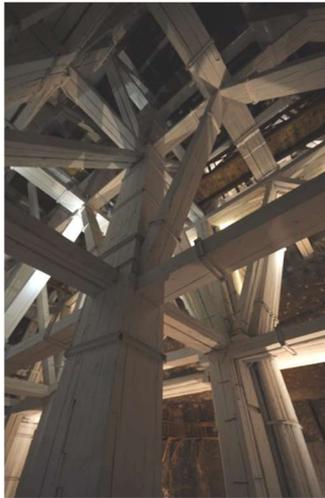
Wooden truss-type support in an excavation mined by block working- Michałowski cavern, salt mine Wieliczka (author: ACM).
